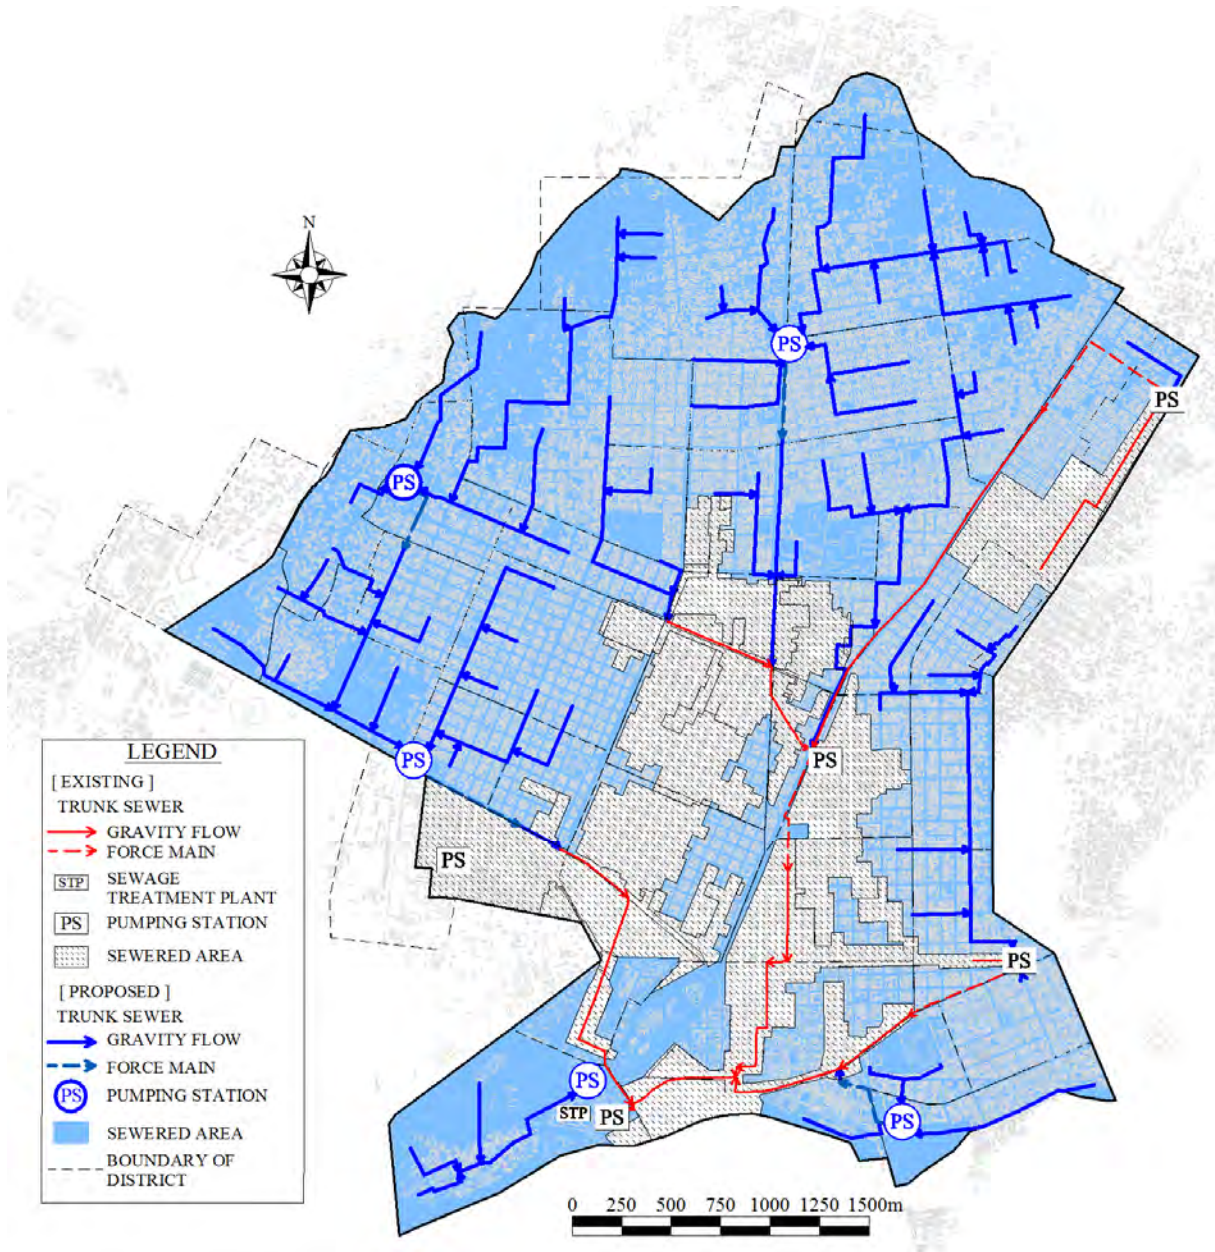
Layout Plan of Alternative 3 (Sewer Network)
